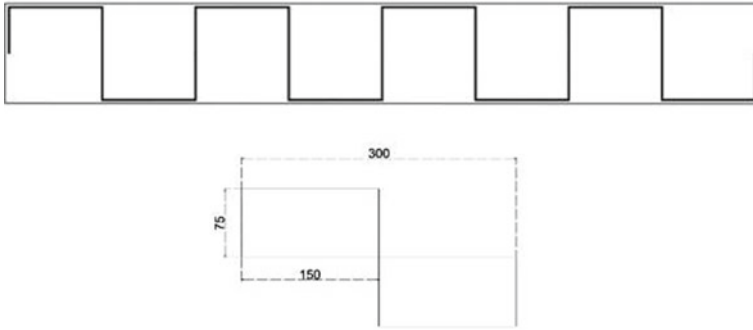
Cross section of beam with rectangular corrugated web and dimensions of each corrugation
